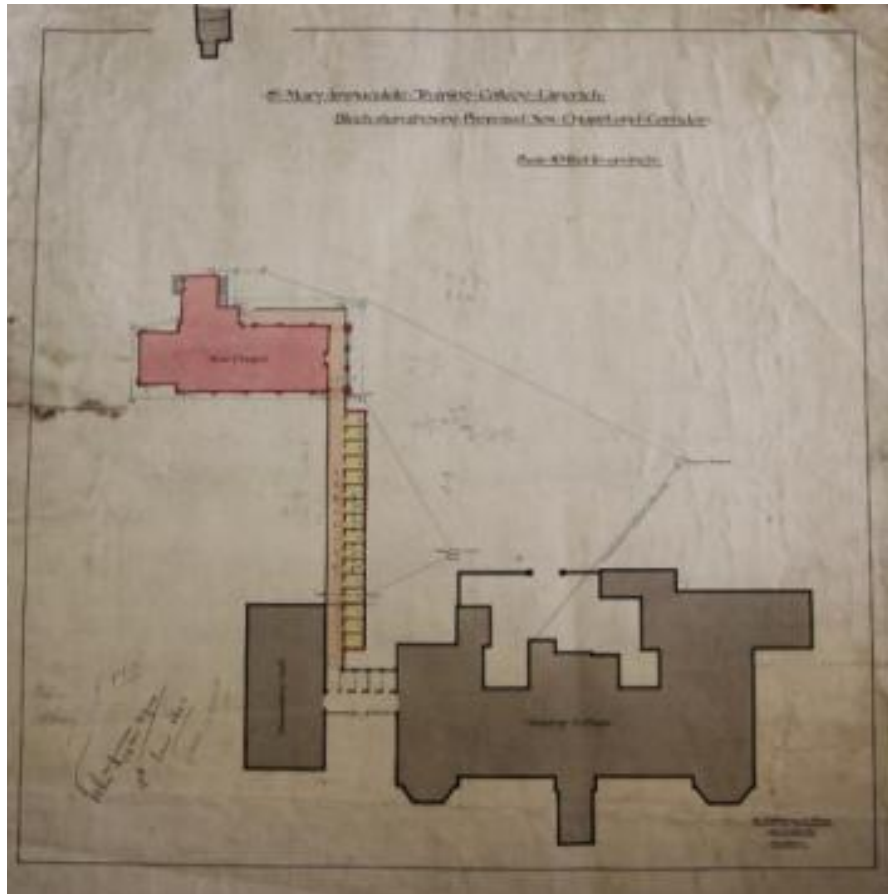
Proposed New Chapel & Corridor - William Henry Byrne 1903 – Irish Architectural Archive
